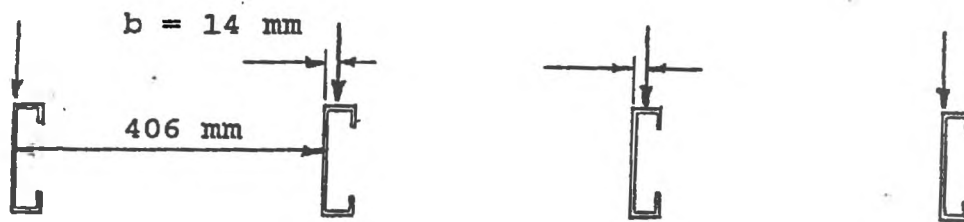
Cross-Section Showing the Location of Loads on the Top Flange of 4 Stud Test Specimen
